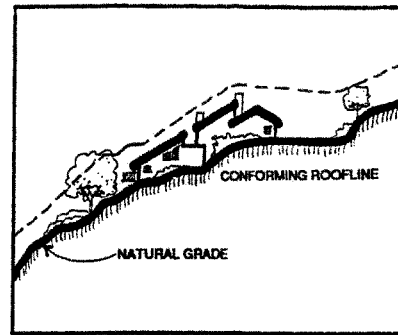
BUILDING HEIGHT/ROOF SLOPE
